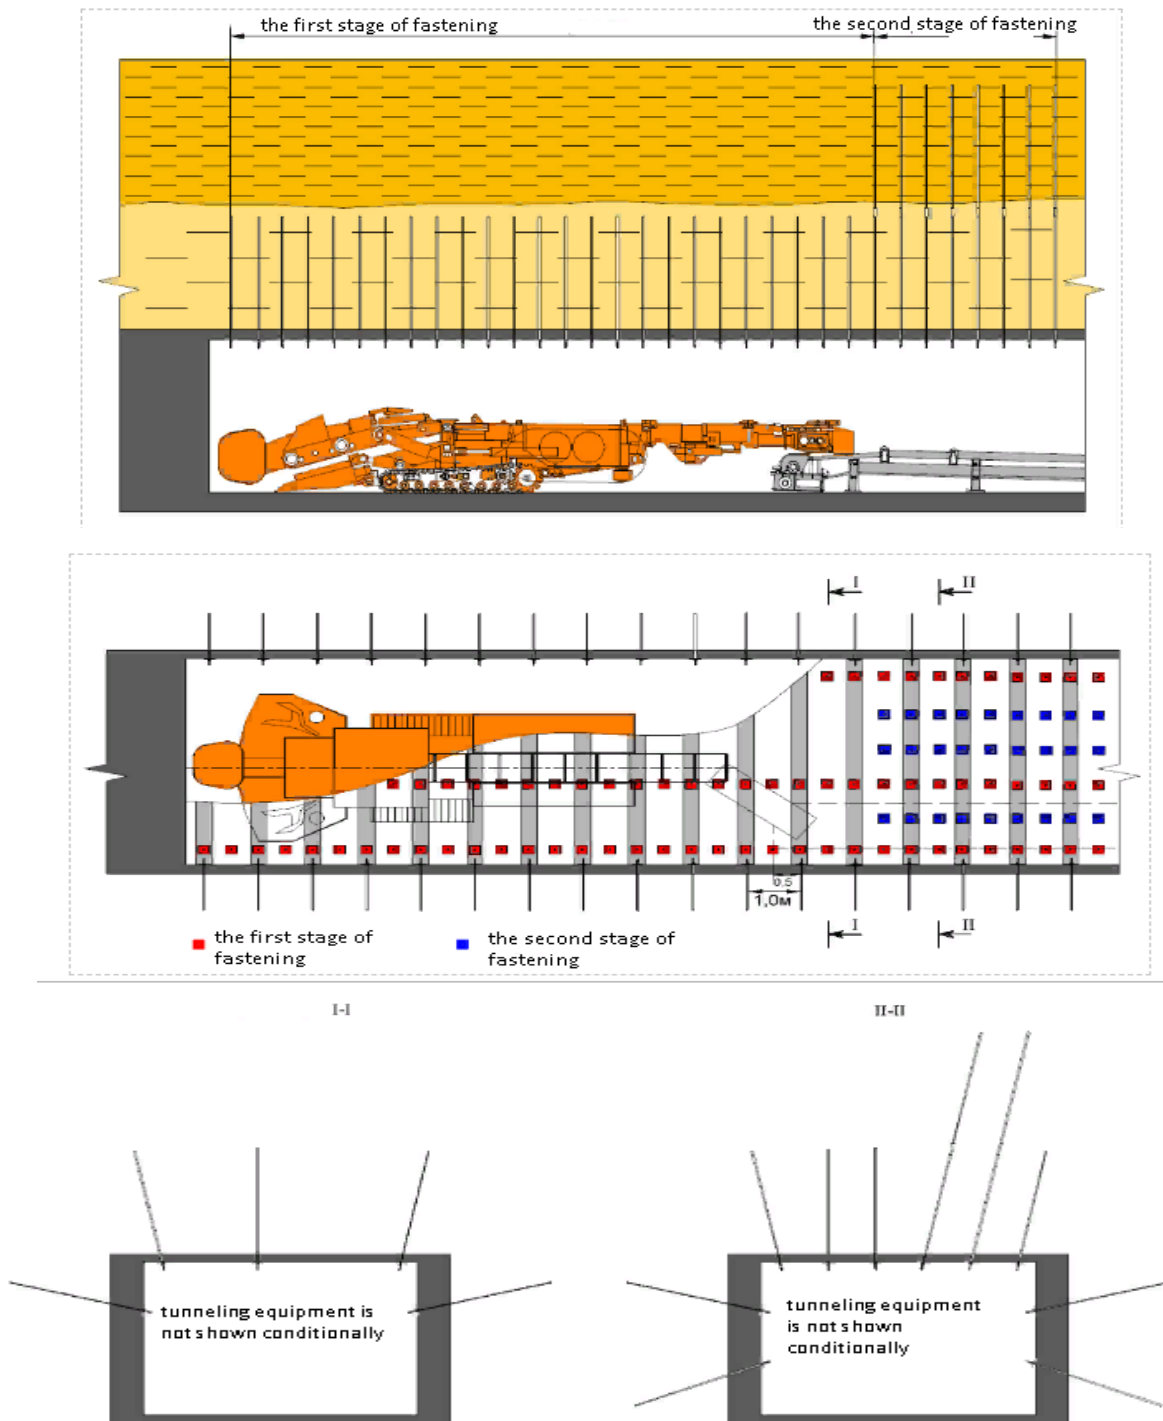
Technology of stage-by-stage anchoring of the preparatory working
